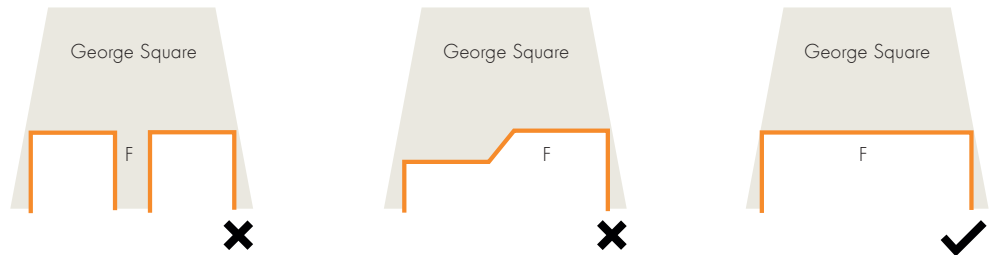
Diagrams showing acceptable and unacceptable George Square building arrangements in plan
